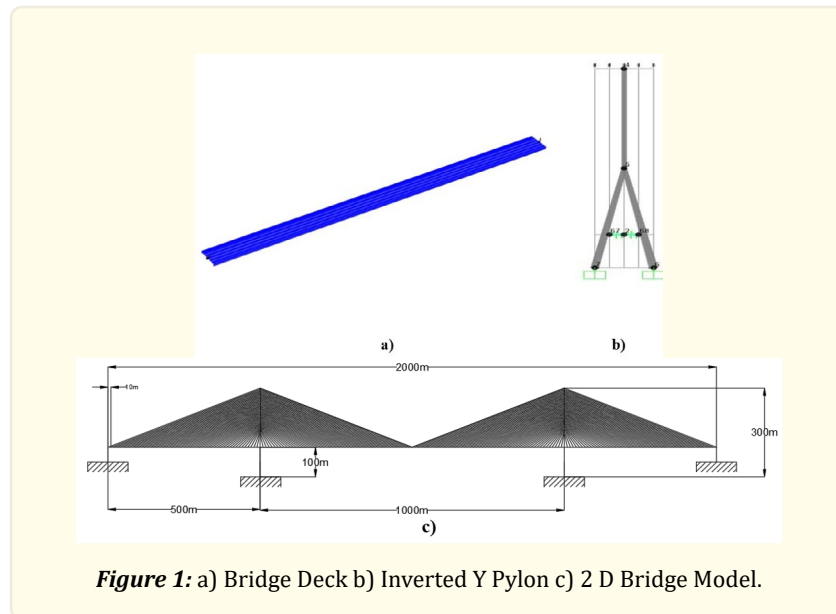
a) Bridge Deck b) Inverted Y Pylon c) 2 D Bridge Model.
